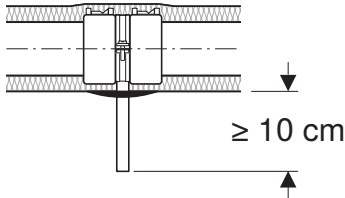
Anchor point for insulated Geberit discharge pipes embedded in concrete
